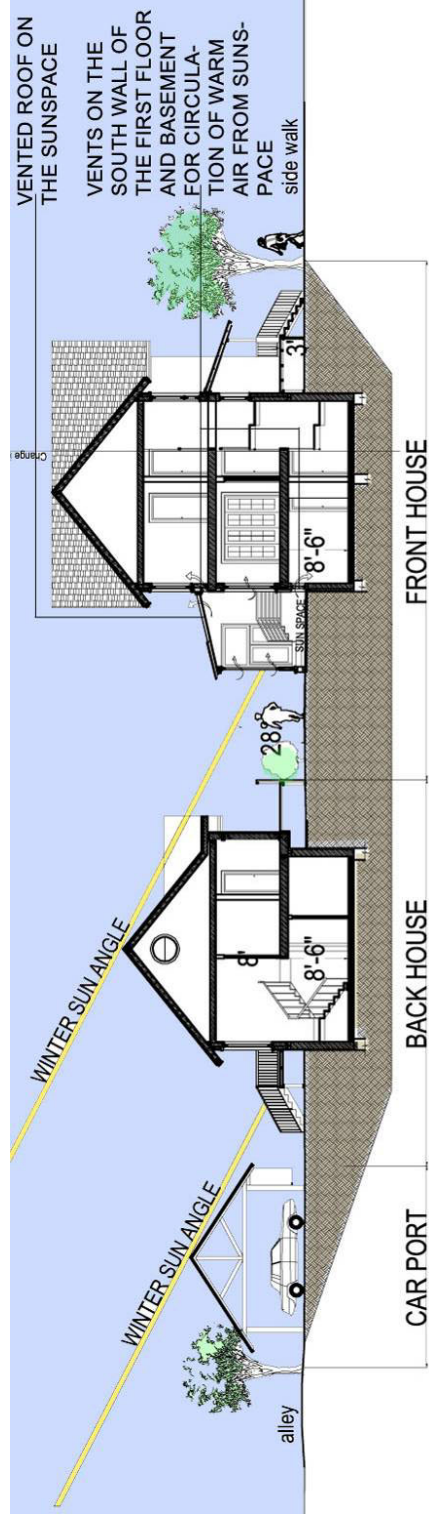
Longitudinal Section 'AA' of a house with Sunspace
